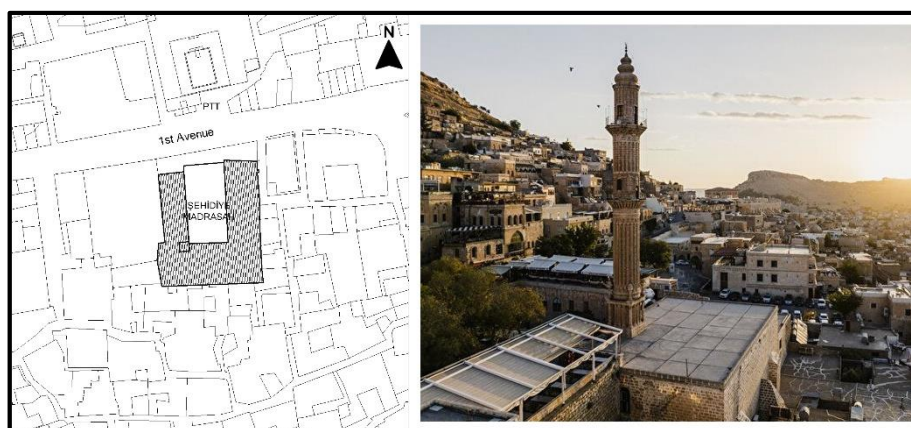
Şehidiye Madrasah Site Plan (İbrahim Duyan Archive) and Aerial Photograph (URL-1)
